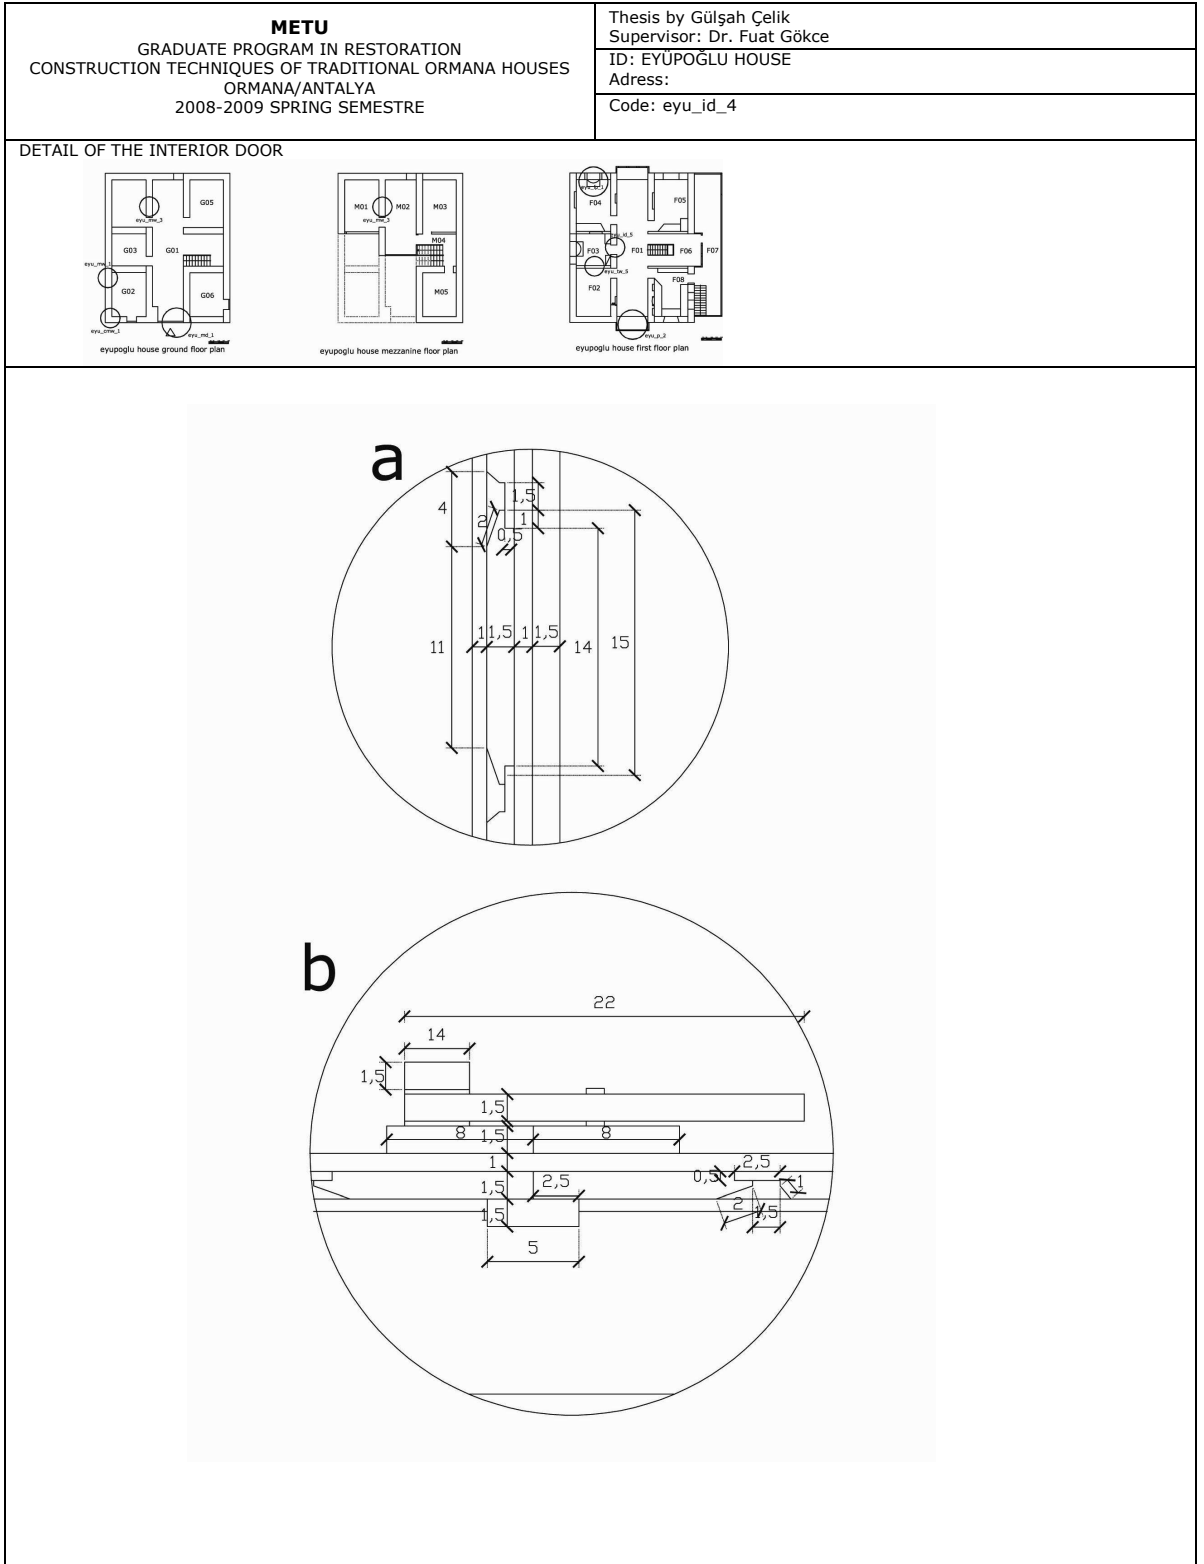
View from the interior door of the Eyüpoğlu House. Çelik, 2008.
